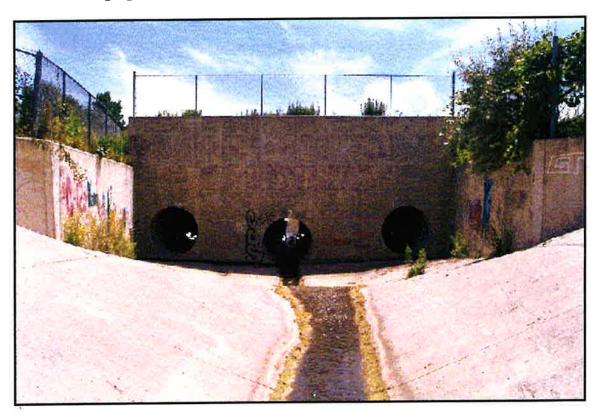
View of the upstream side of the CNR crossing with the triple 2100 mm concrete pipe culverts. Note the vegetation growth out of the concrete.
